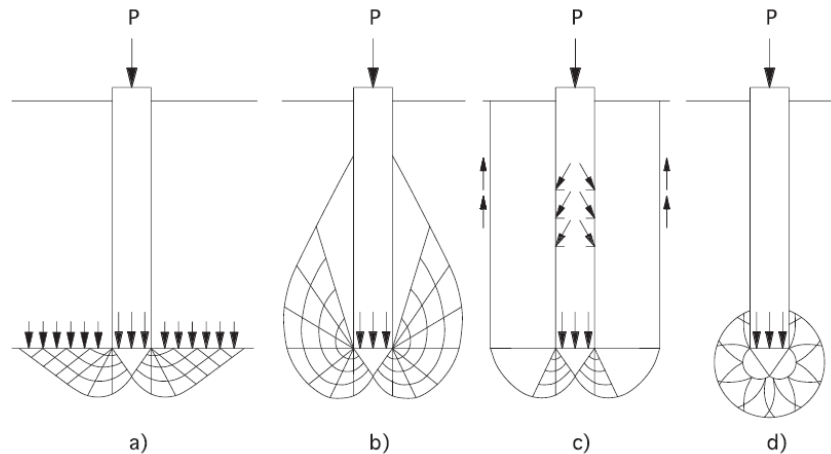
Failure surfaces under deep foundations, after [31]
